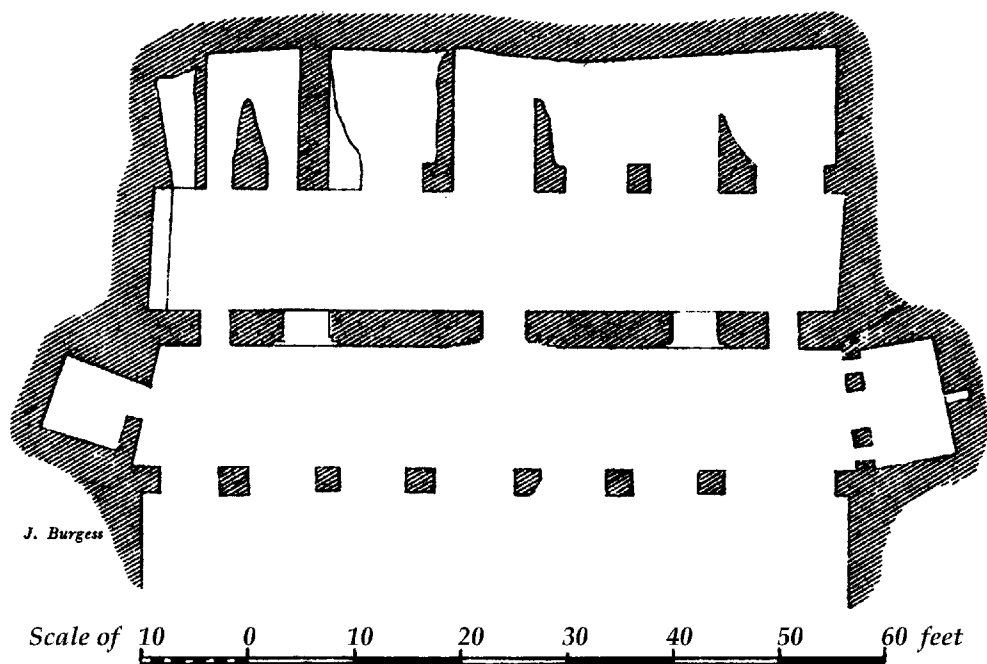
Ajanta Cave 14 plan (BCT 28)
